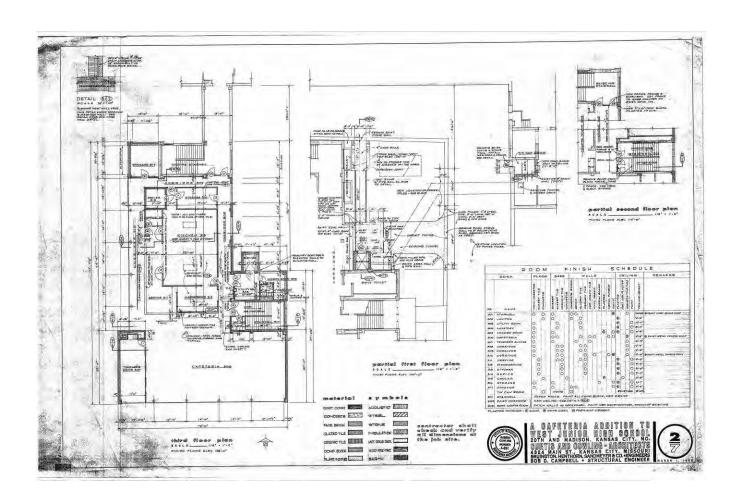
West Side Jr. High: Industrial Arts Cafeteria Addition 1962: Third floor plan Curtis and Cowling, architects
